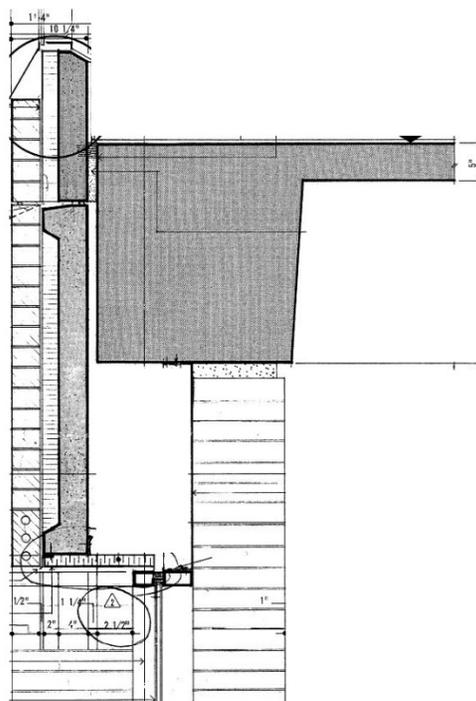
A section illustrating the skirt panel construction at ground-floor glazing. Taken from the original architectural drawings (Arcop, 1977).
